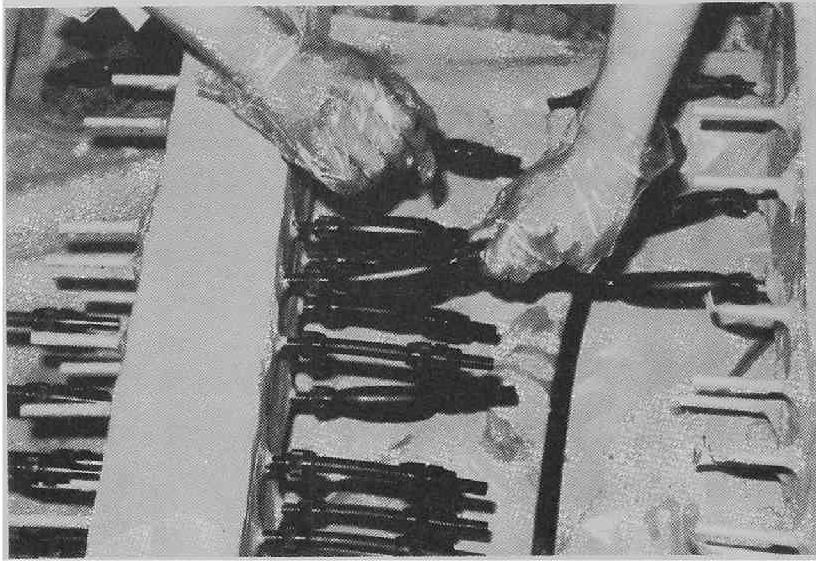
Type I repair: Grouting epoxy resin into gum tubes.
